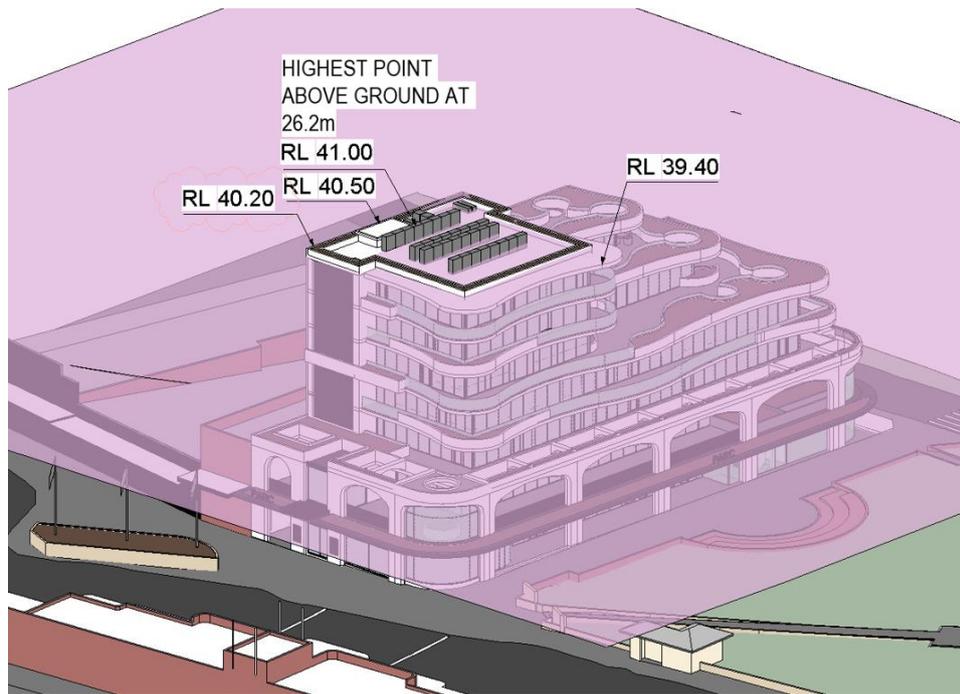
Height plane diagram and section showing which elements depart from the standard (source: Innovate)
